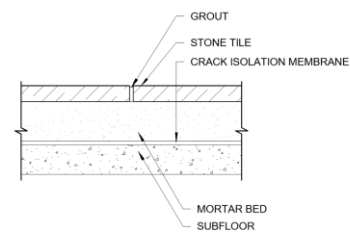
Mortar Bed Separated from Concrete/Wood Subfloor Method
